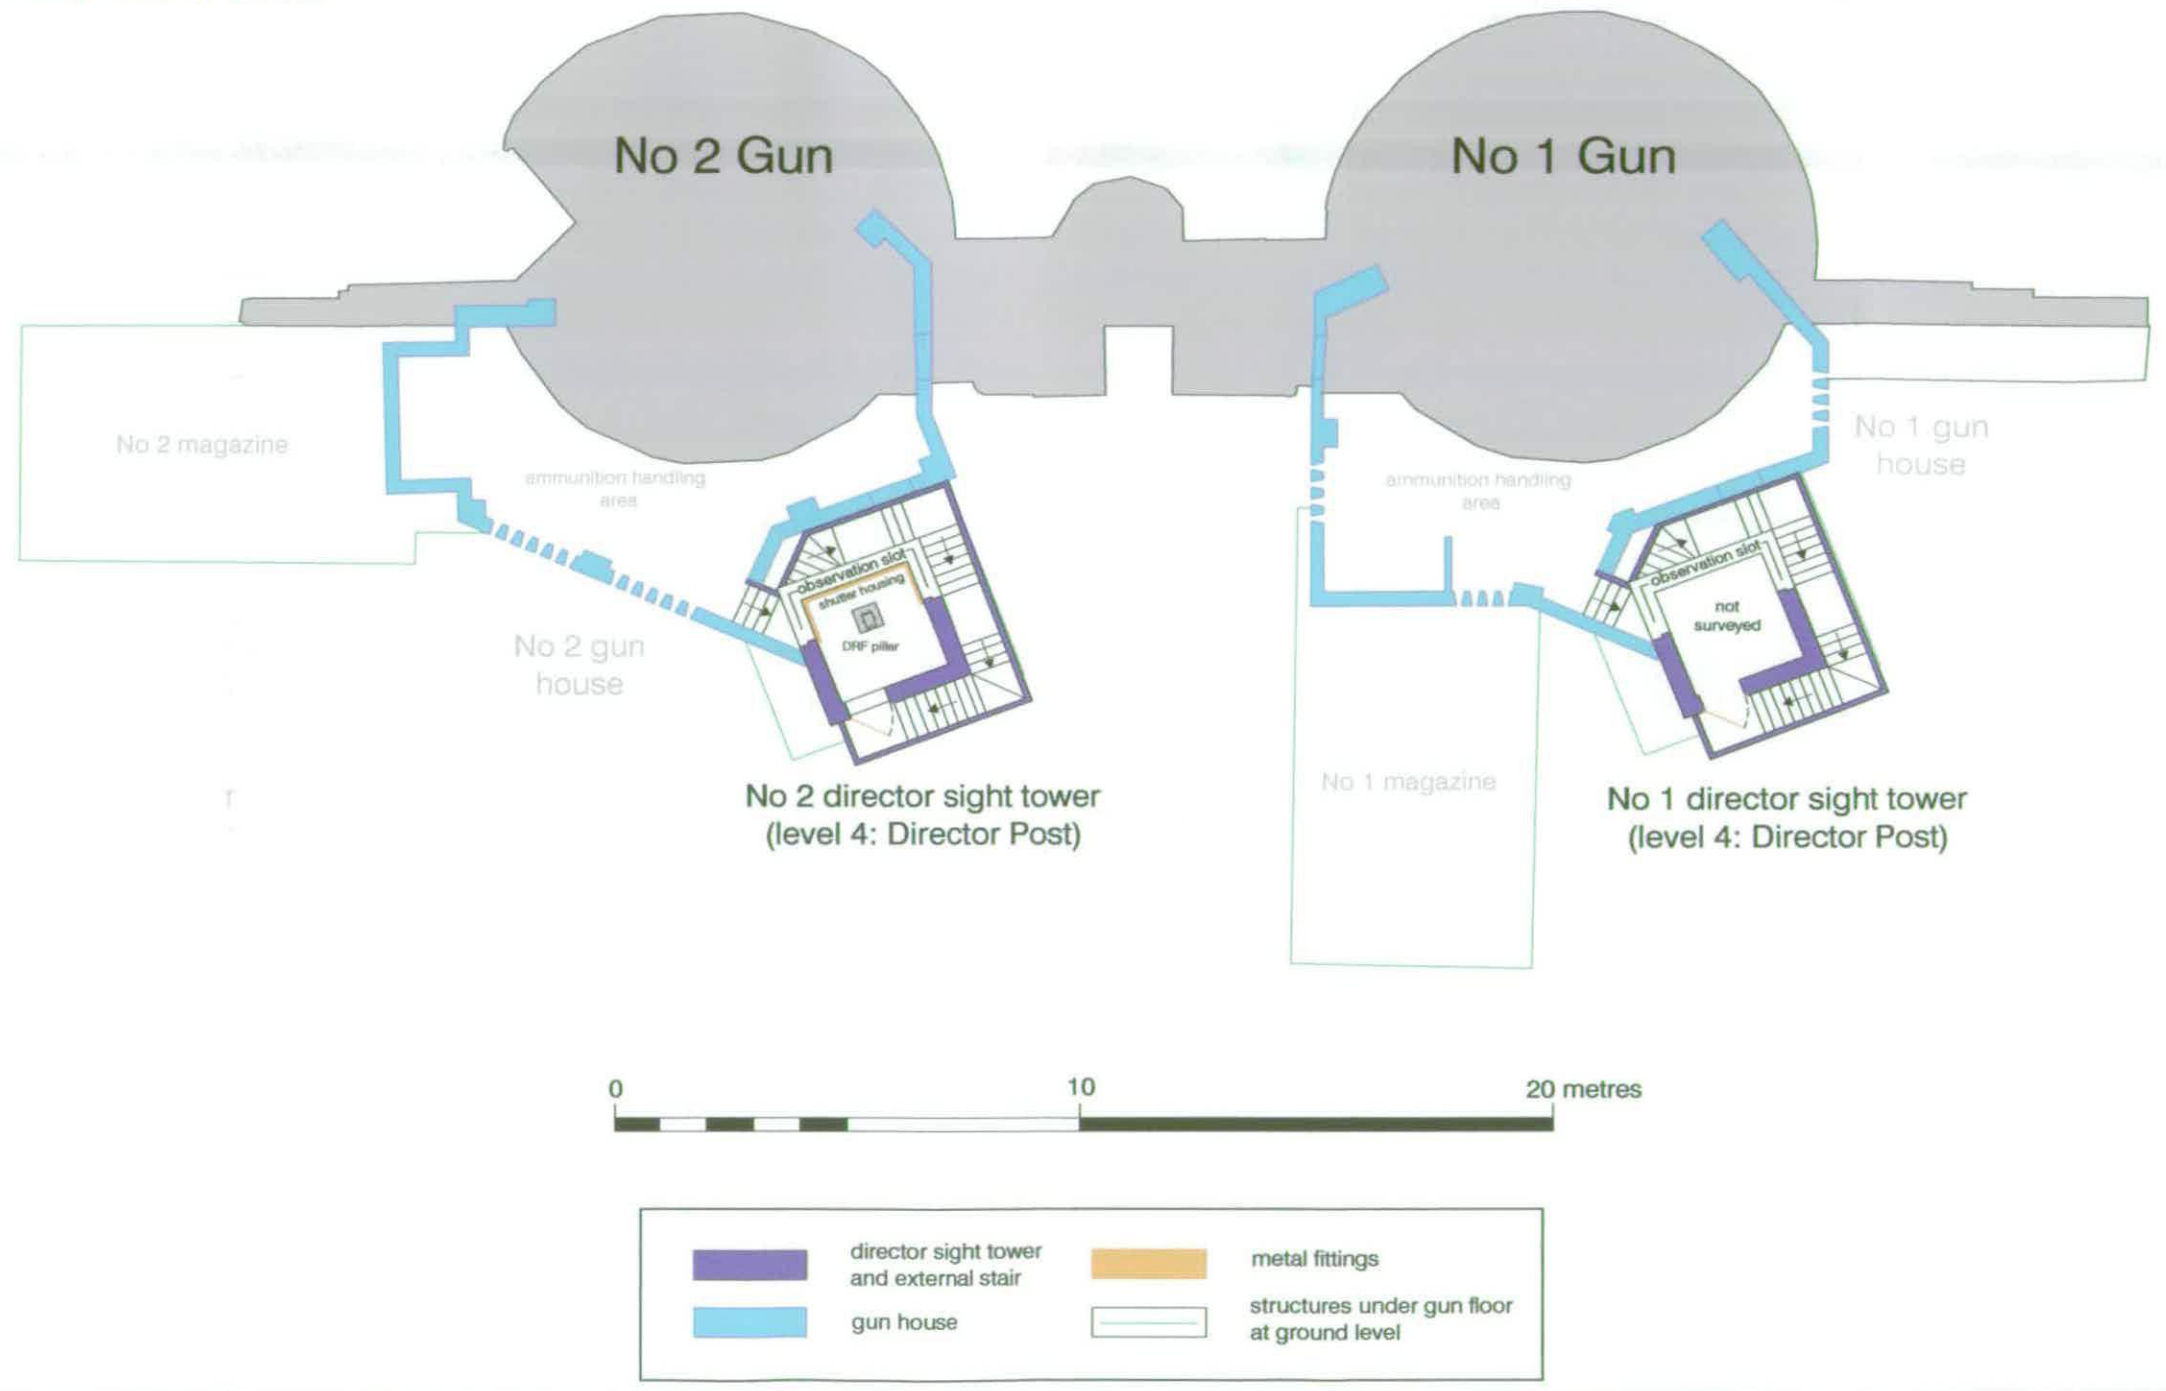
Darell's Battery twin 6-pdr equipment; detailed plan showing level 4 of the director sight towers
